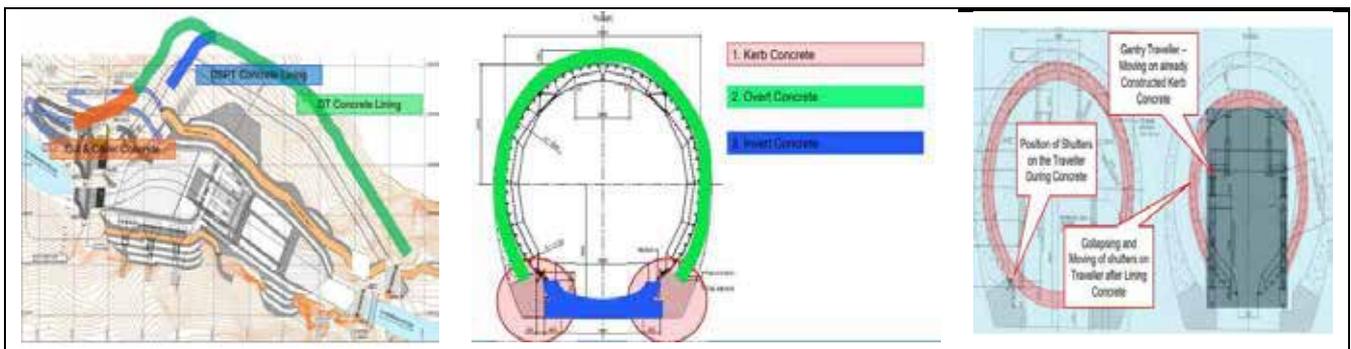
Diversion tunnel Concreting works and sequence of Concrete adopted
